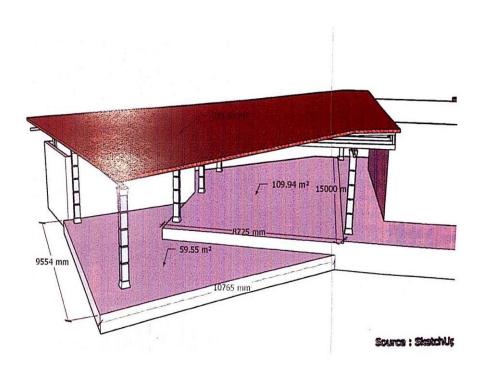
Floor Plan of area to install the ceramic tiles in Surau Taman Perumahan Cheneras Jaya
